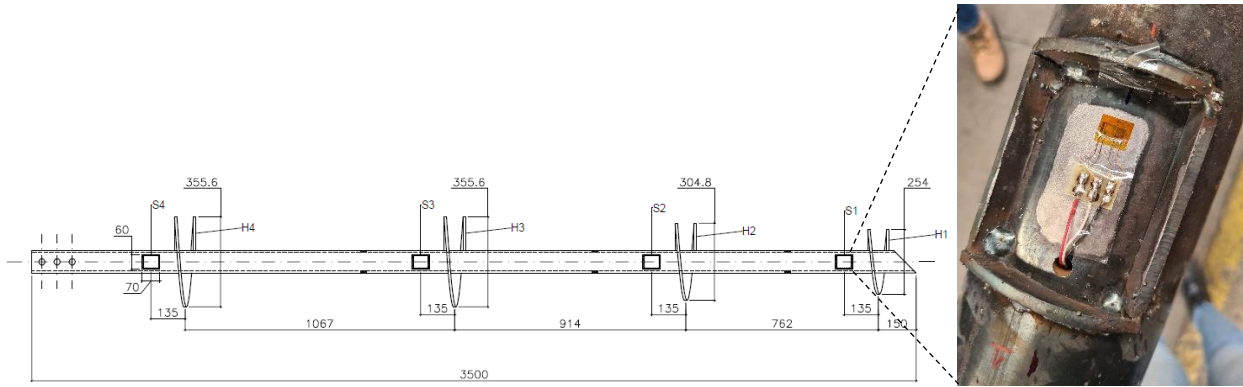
Details of the lead section of the tested helical pile (dimensions in mm) and of an instrumented section.
